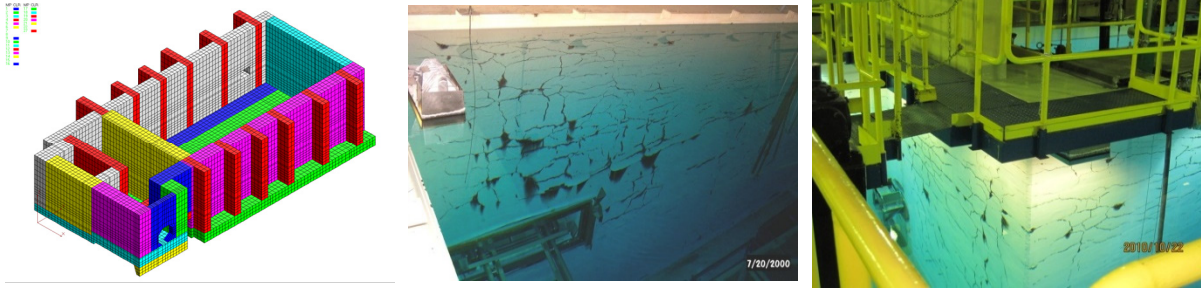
The waste storage pool due to AAR related concrete cracking
